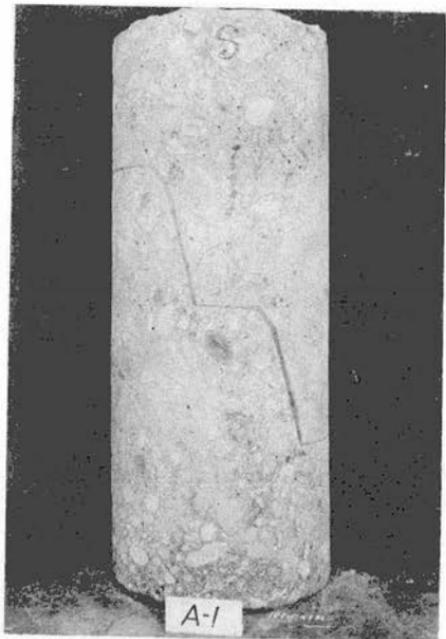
Core A-1 with Keyed Joint Showing Grout Layer Before Testing. Grouted at 50 psi.
